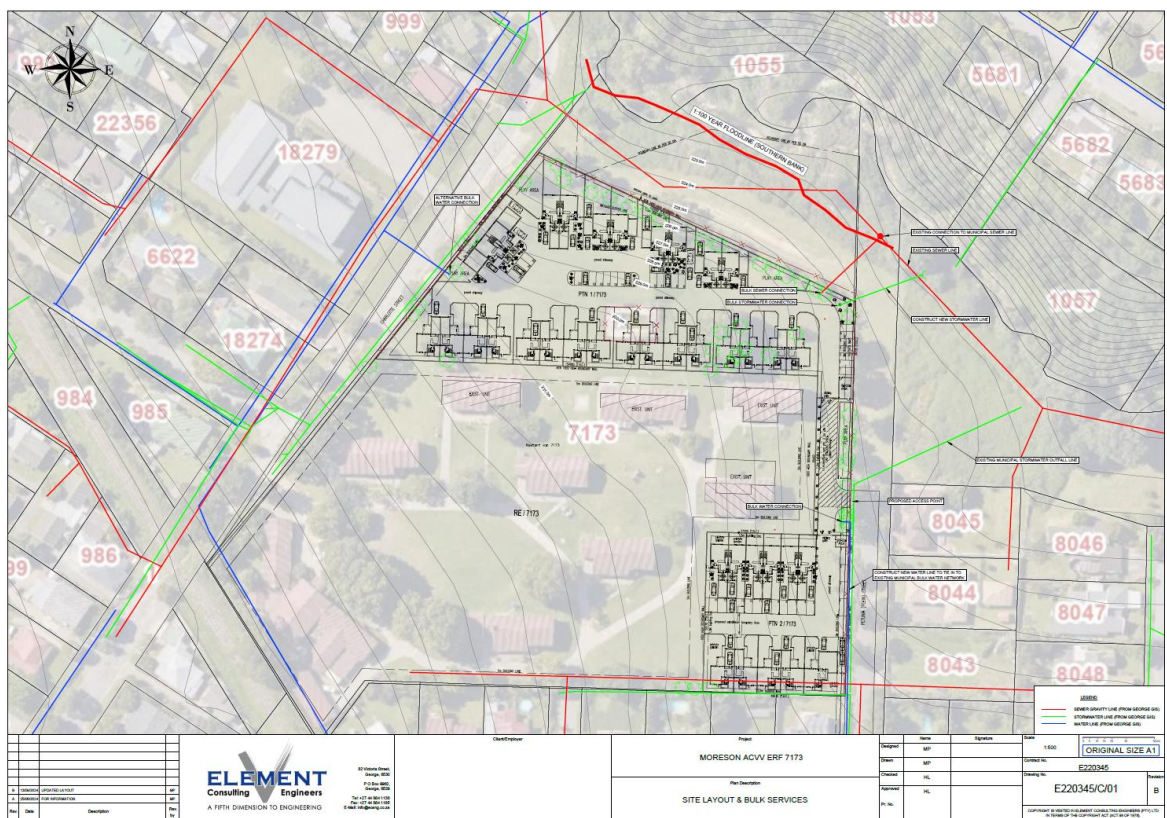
Bulk sewer connection on north-eastern corner of the site.
